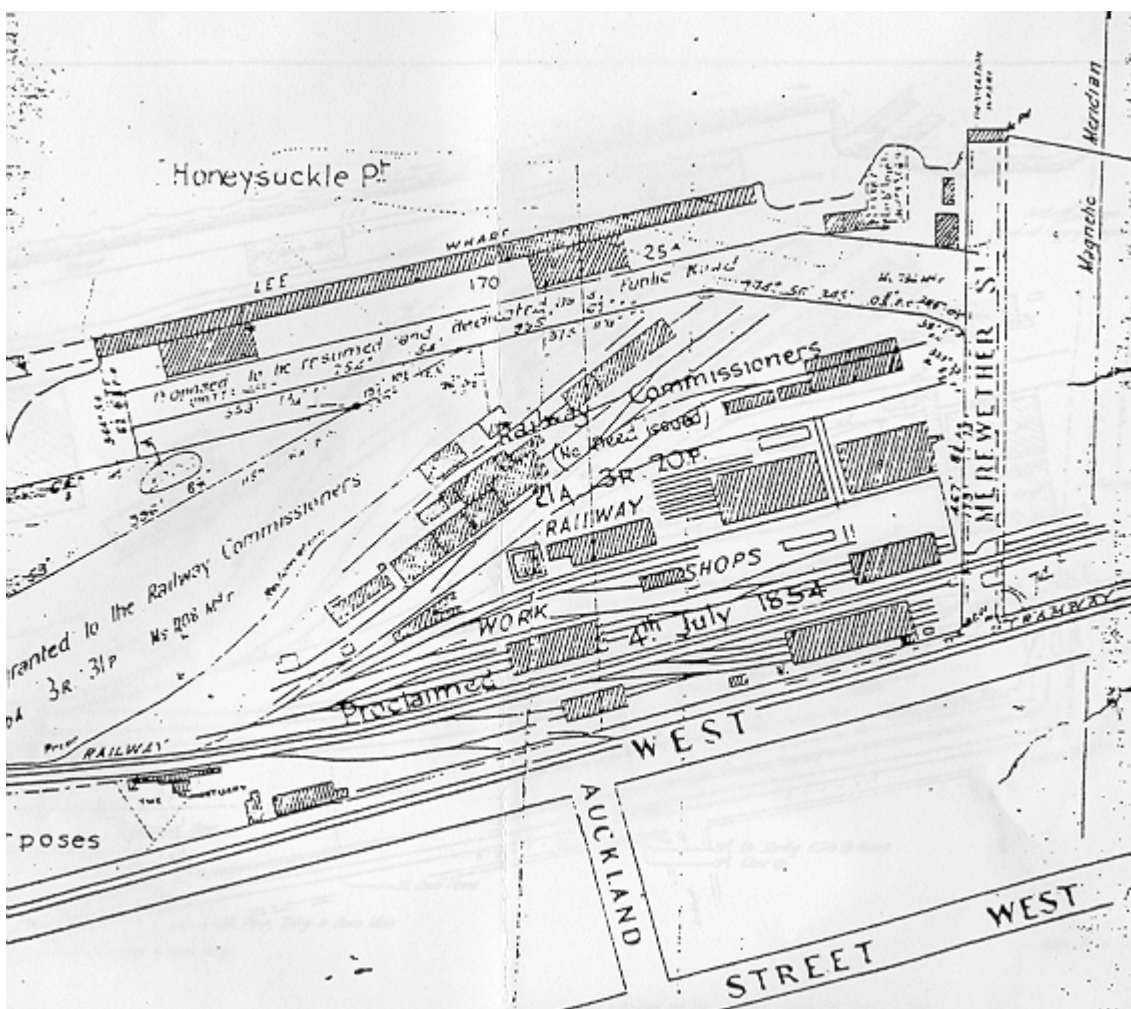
Newcastle Harbour Improvements Plan showing reclaimed land proposed to be transferred to the Railway Commissioners at Honeysuckle, Newcastle, February 1916. The plan shows the areas reclaimed for Lee Wharf as well as the Per Way Store and associated buildings, obviously due to their different alignment to the main yard. (Source: Honeysuckle Point Heritage Study)
